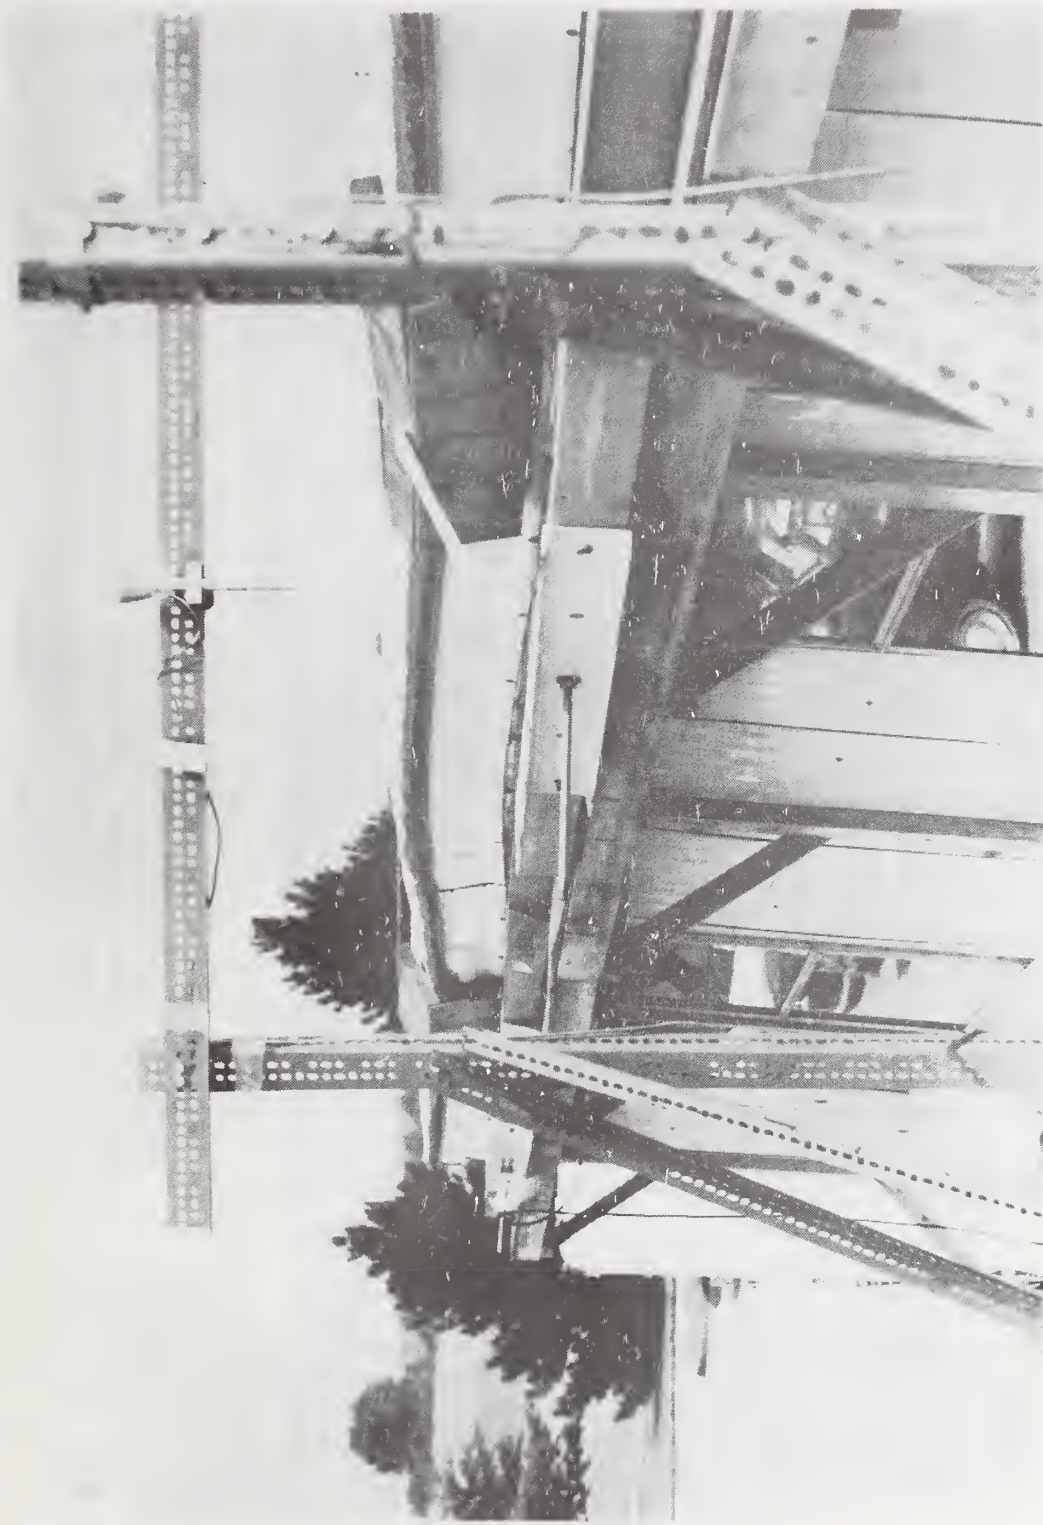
View of Failure in Roof-to-Wall Connection (load applied)
